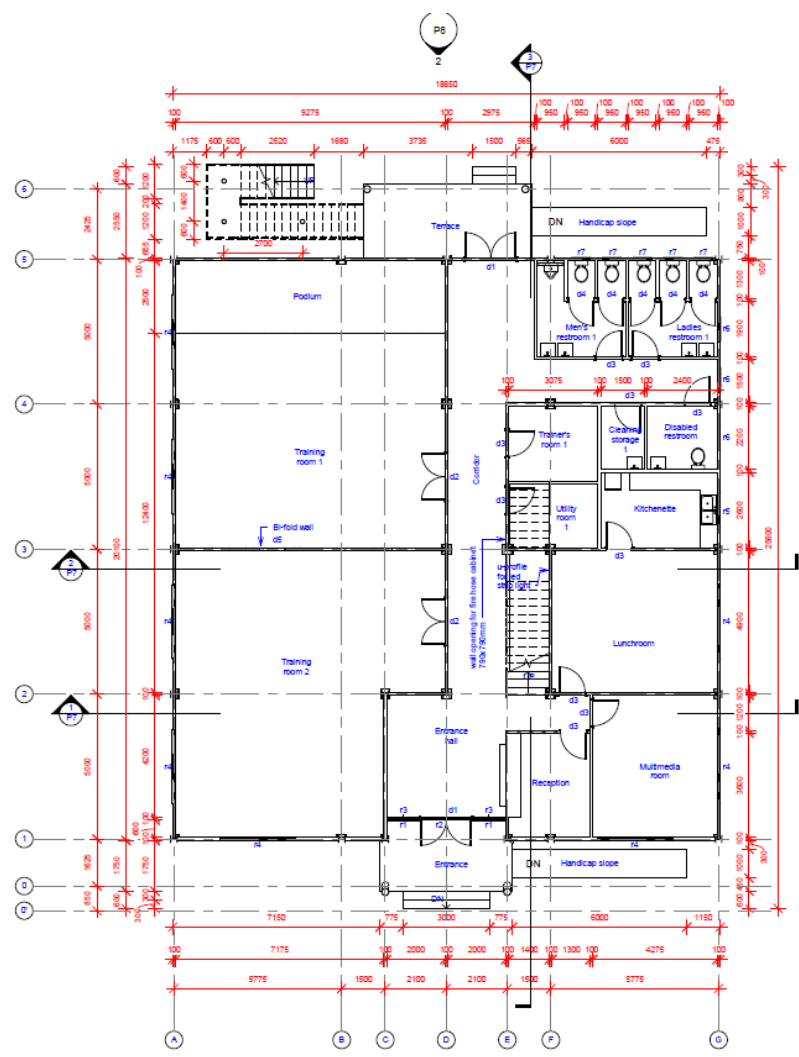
Architectural Layout Ground Floor (SINTEC NV, 2018).
